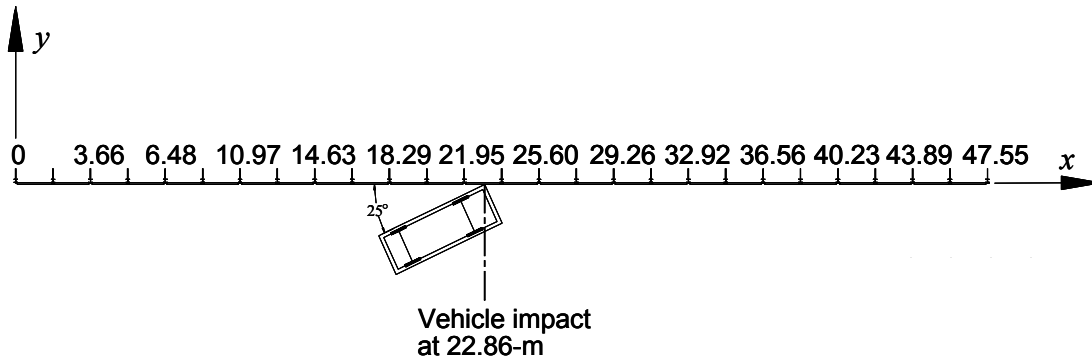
Guardrail System Layout (all dimensions in meters)
